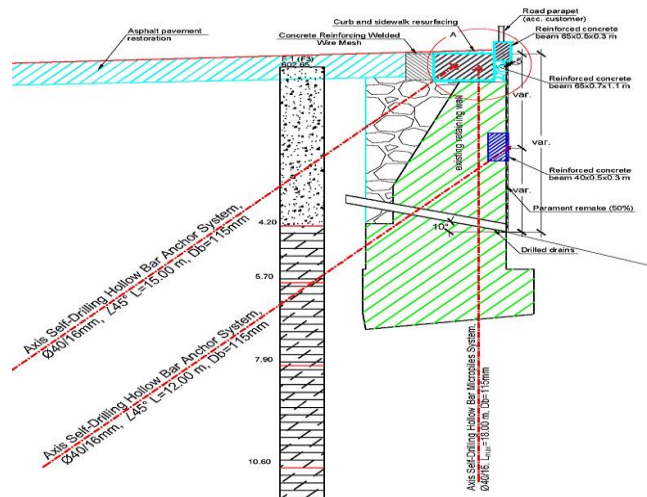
Characteristic section - designed solution for consolidation of the retaining wall.
